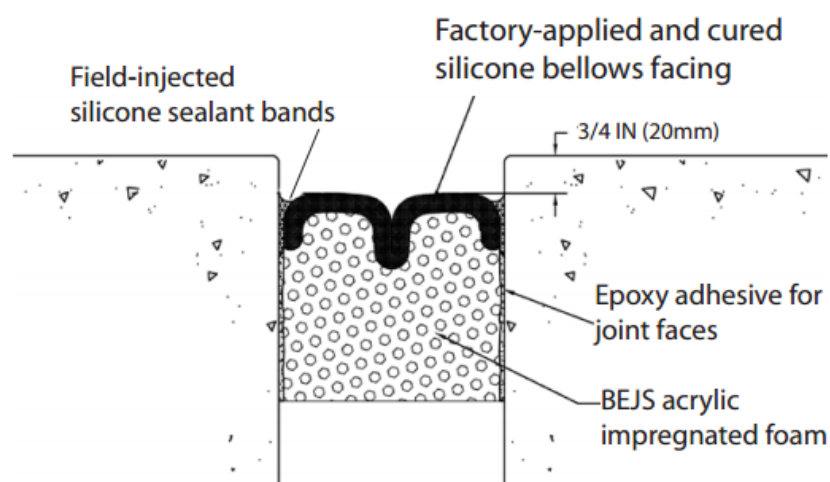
BEJS joint in typical installation — new or retrofit (EMSEAL, 2016)
